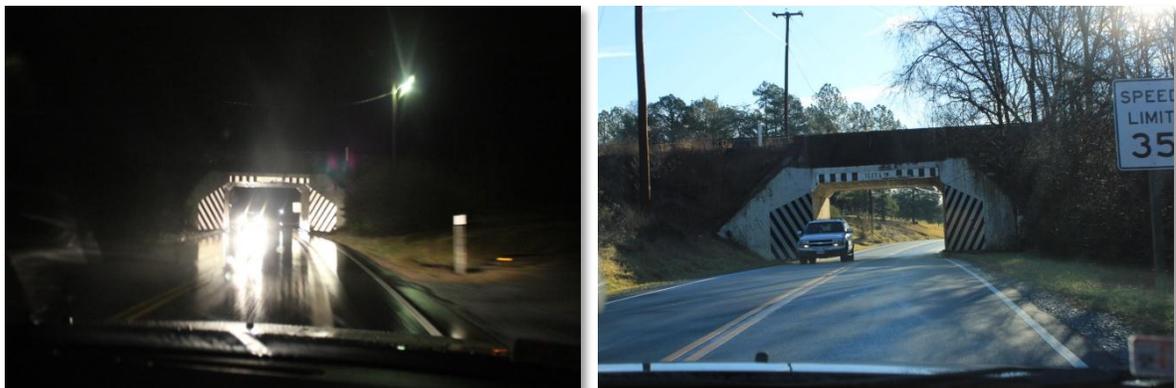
Narrow roadway section under bridge. Good retroreflectivity. Segment 5
